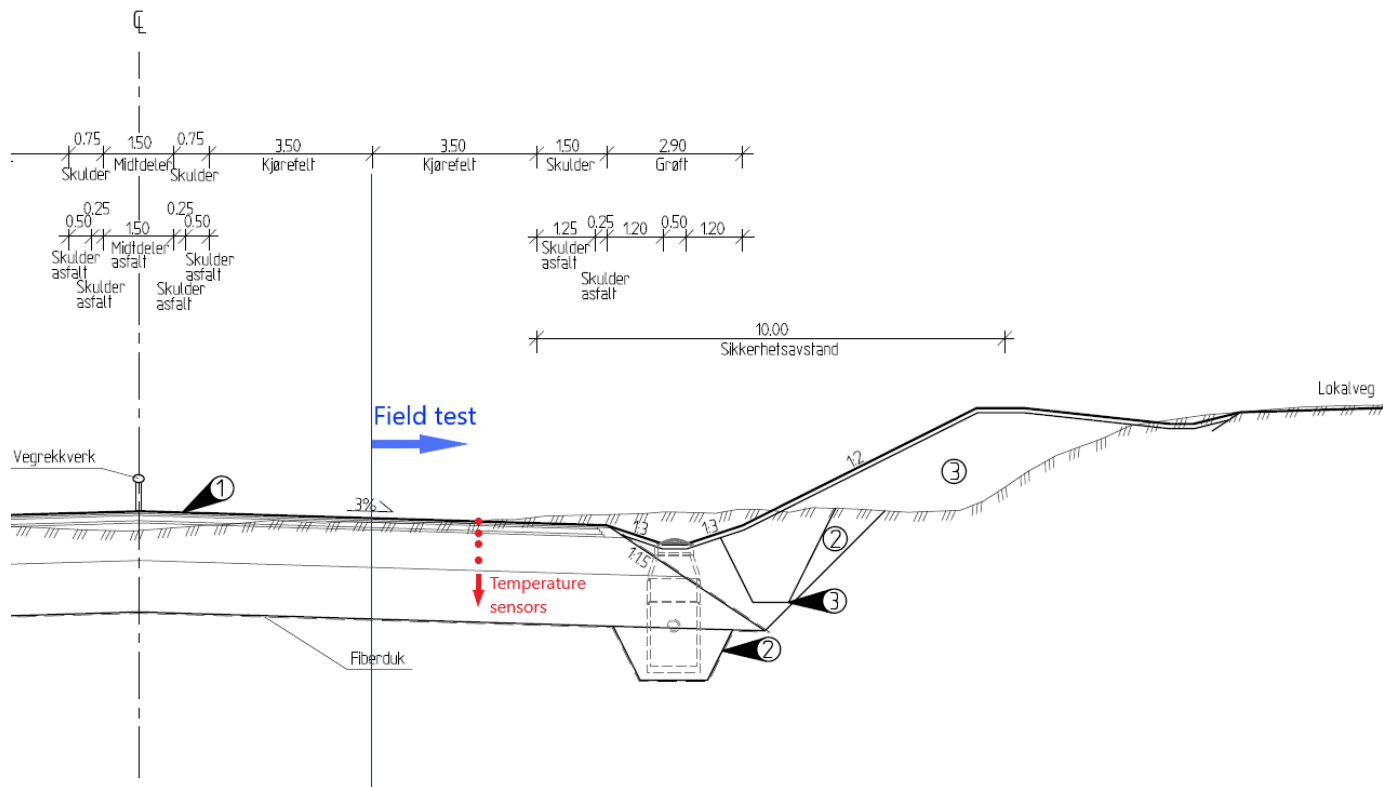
Part of cross section for E6 at Jaktøyen with the field test as the outer north going lane
